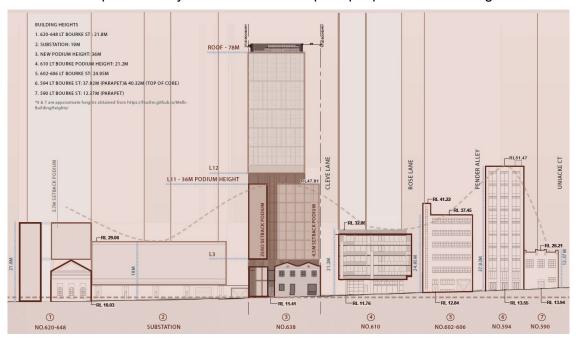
Streetscape elevation illustrating proposed massing response to retained heritage building and neighbouring forms
